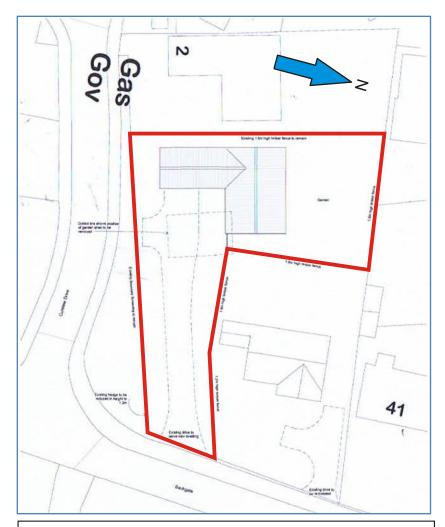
Block Plan Showing the Layout of the Proposed Development at an original scale of scale 1:200, (not to scale), (extract from Architects plan). The site is shown outlined in red.
